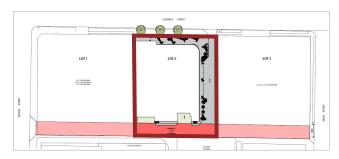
Plan showing the re-subdivided site, with subject site outlined in red. North is to the top. Base image courtesy of Rothe Lowan Pty Ltd
